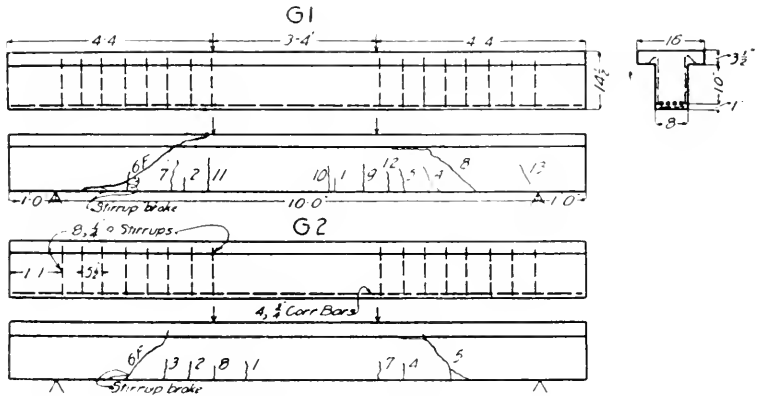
View Showing Reinforcement and Cracks Test Beams, Diagonal Failure
